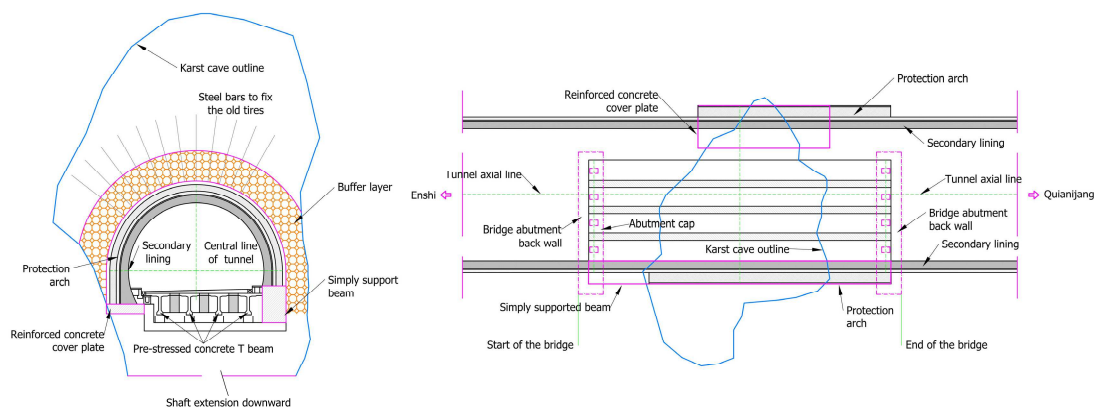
Diagram of the passage through the cavernous zone during the construction of the Huaguoshan tunnel [25]
